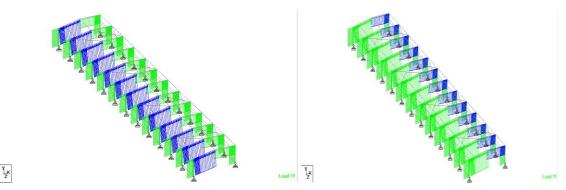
Wind load acting on Roof C & Wind load acting on Roof D
